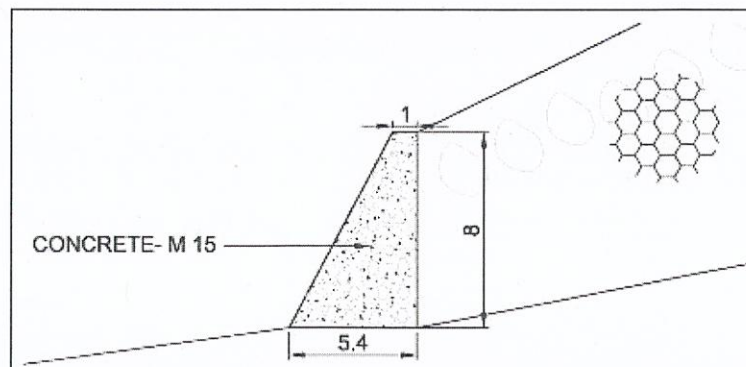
Typical Cross section of proposed concrete retaining wall
